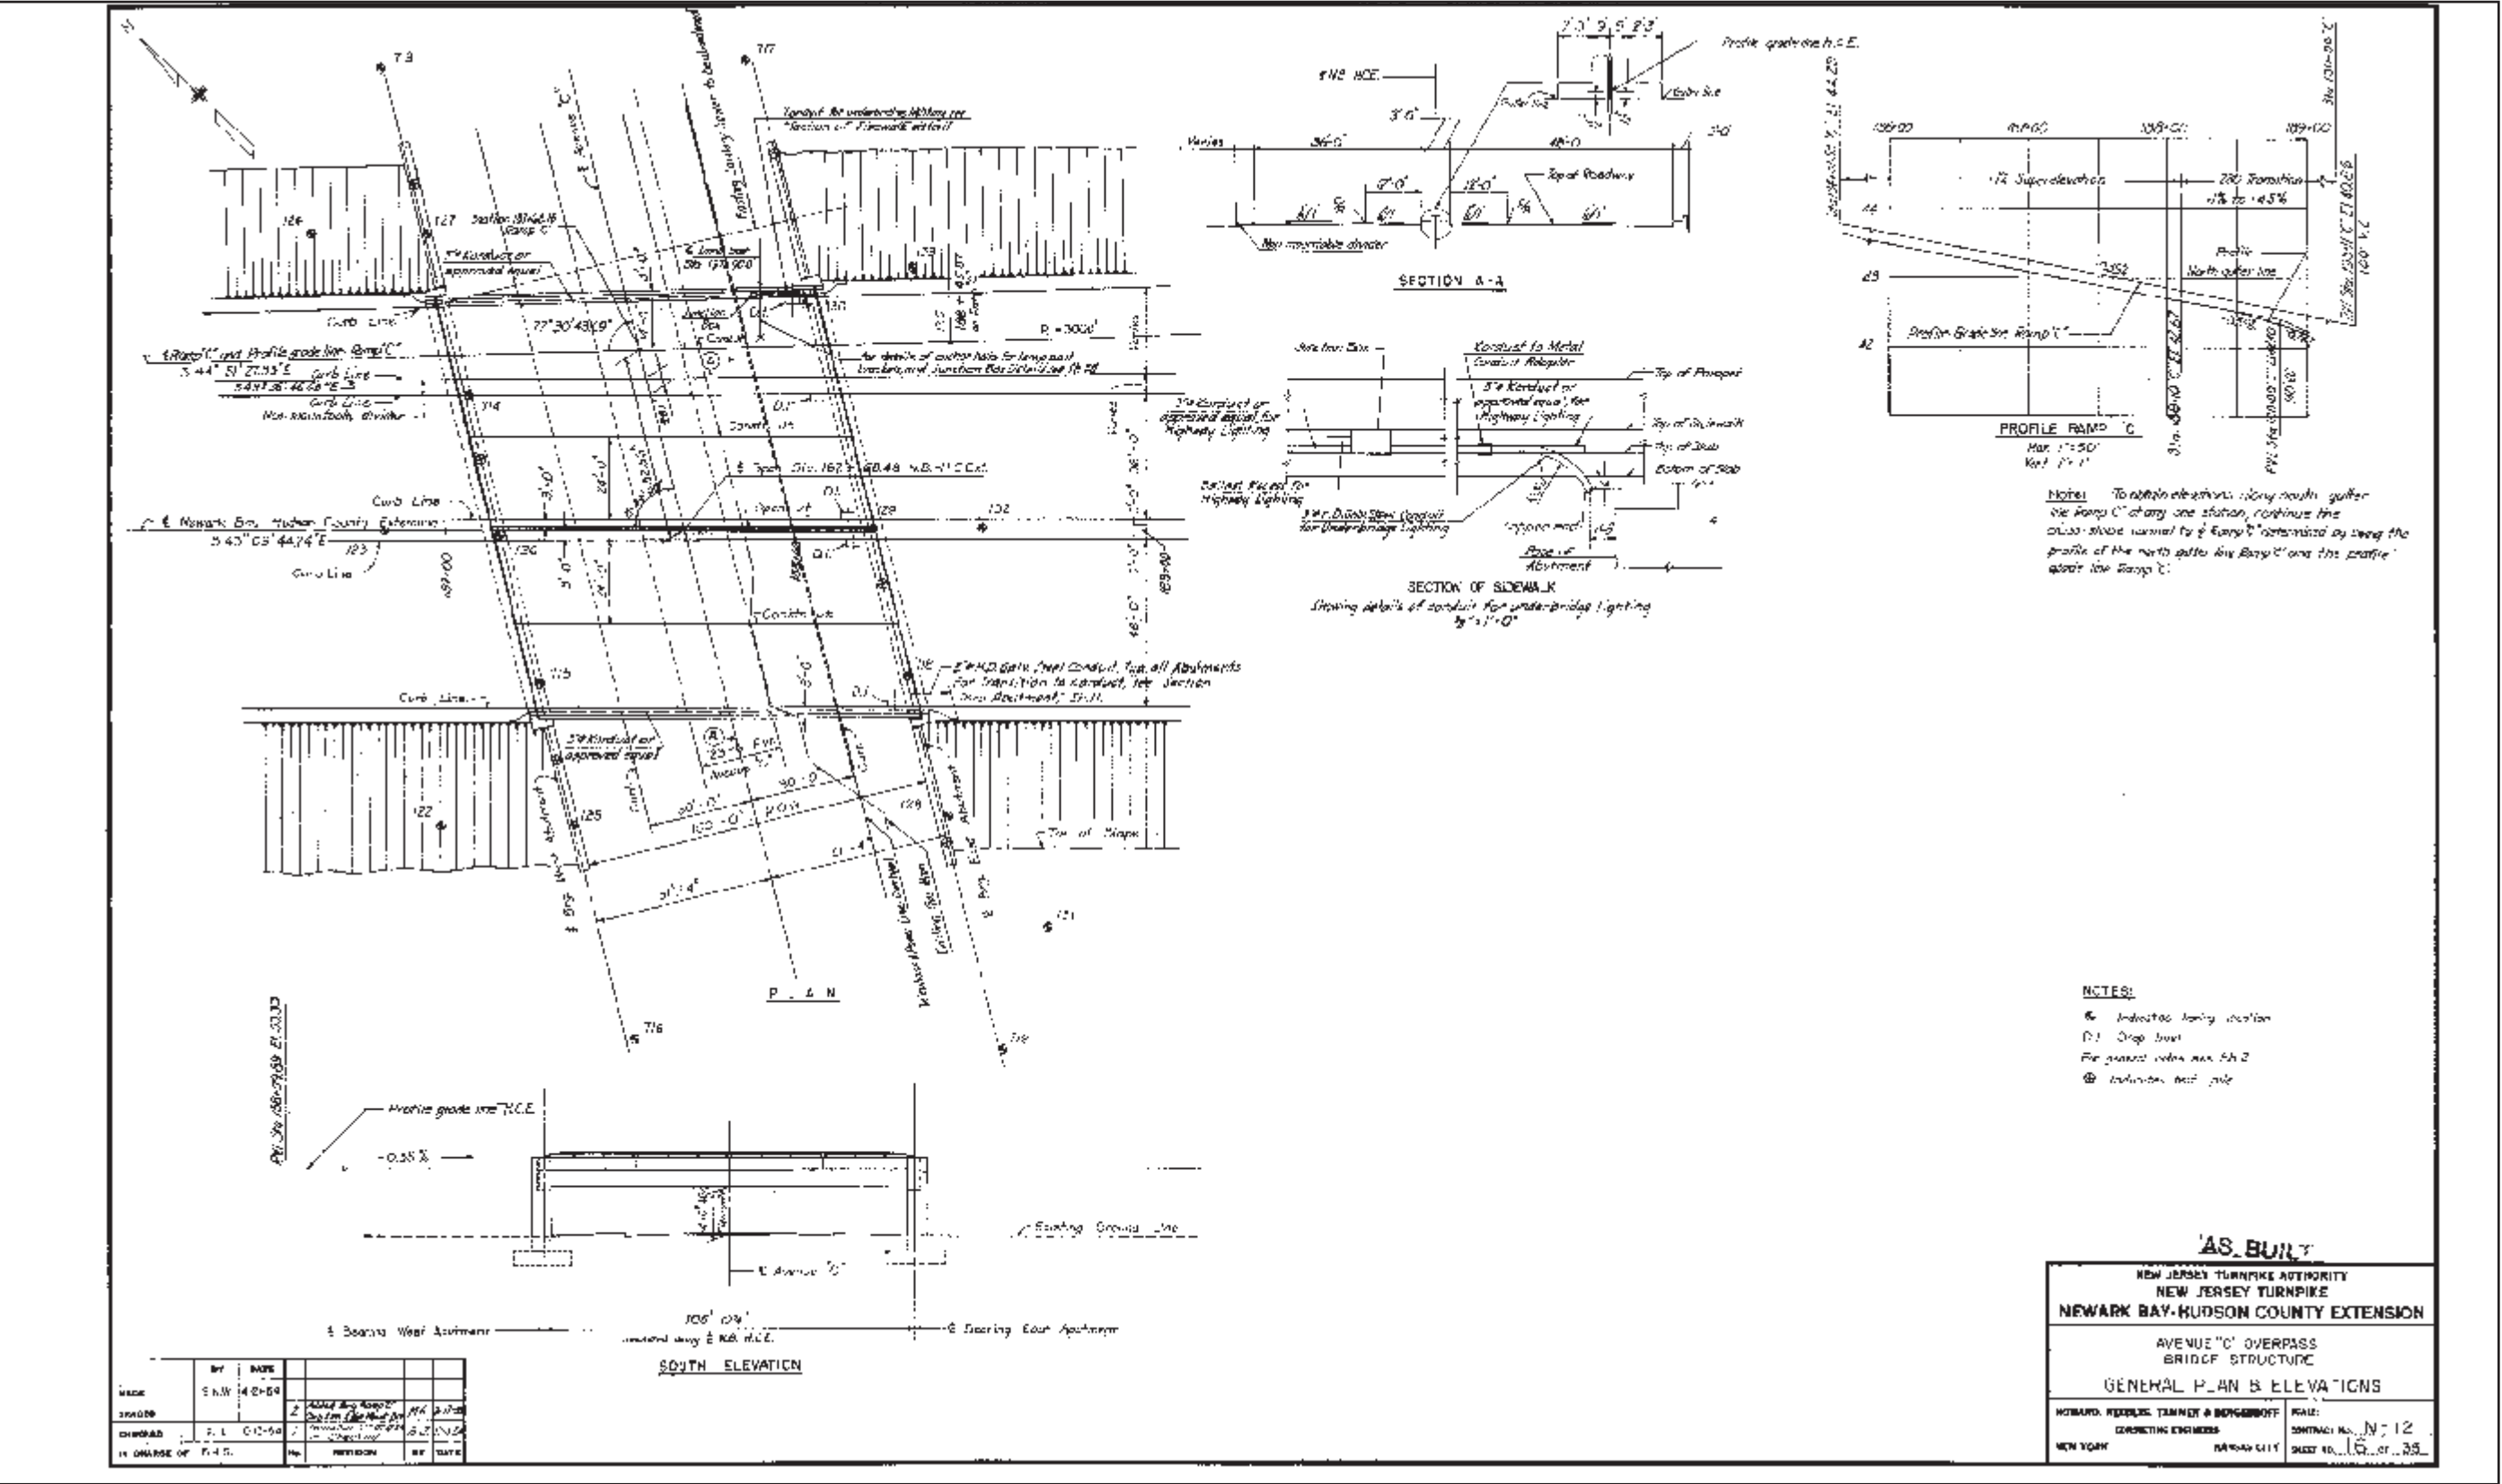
1955 as-built construction drawing showing the general plan and elevation of the Bridge over JFK Boulevard (formerly Hudson Boulevard Overpass) (HNTB 1955b).
